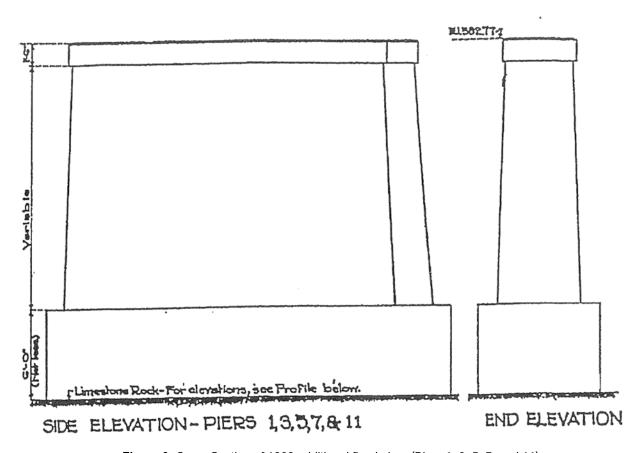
Cross Section of 1929 additional fixed piers (Piers 1, 3, 5, 7, and 11)
